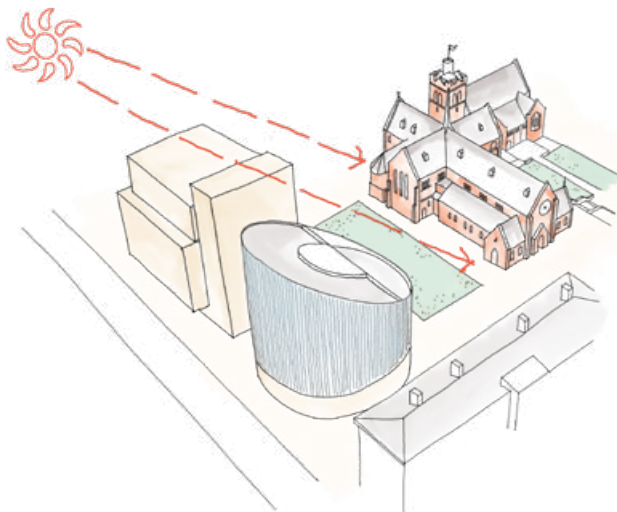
Protect sunlight access and the settings of heritage buildings and cultural places.
